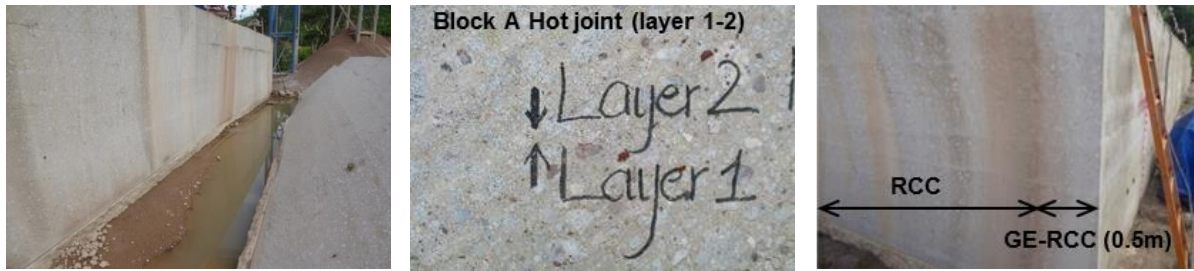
Band Sawing Cut in Primary FSTE, Hot Joint, Interface of GE-RCC and RCC
